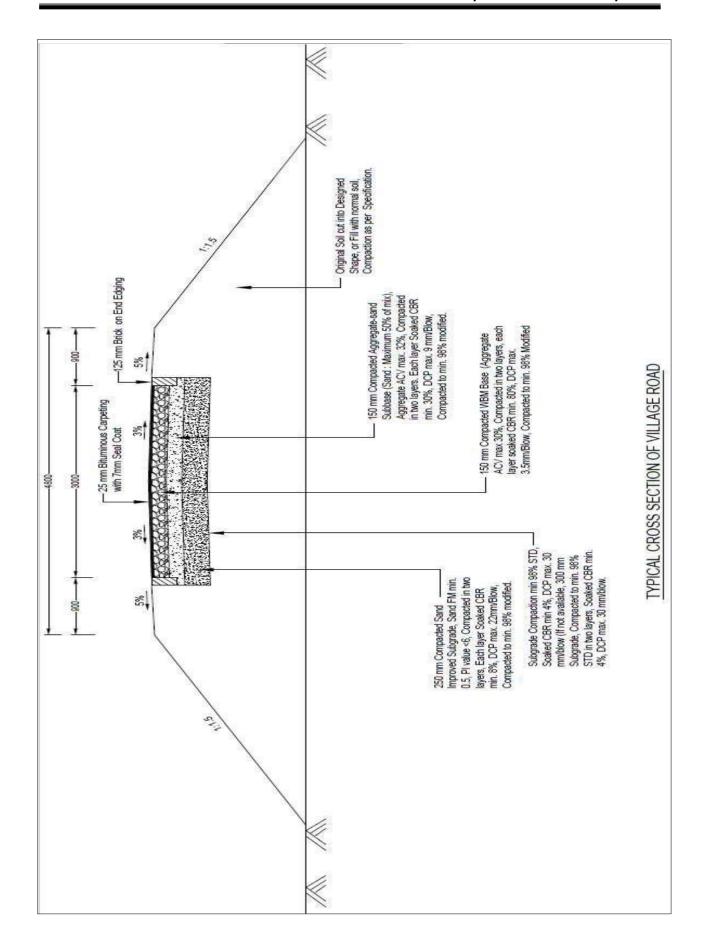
Typical Cross Section of Village Road (LGED, 2005)
